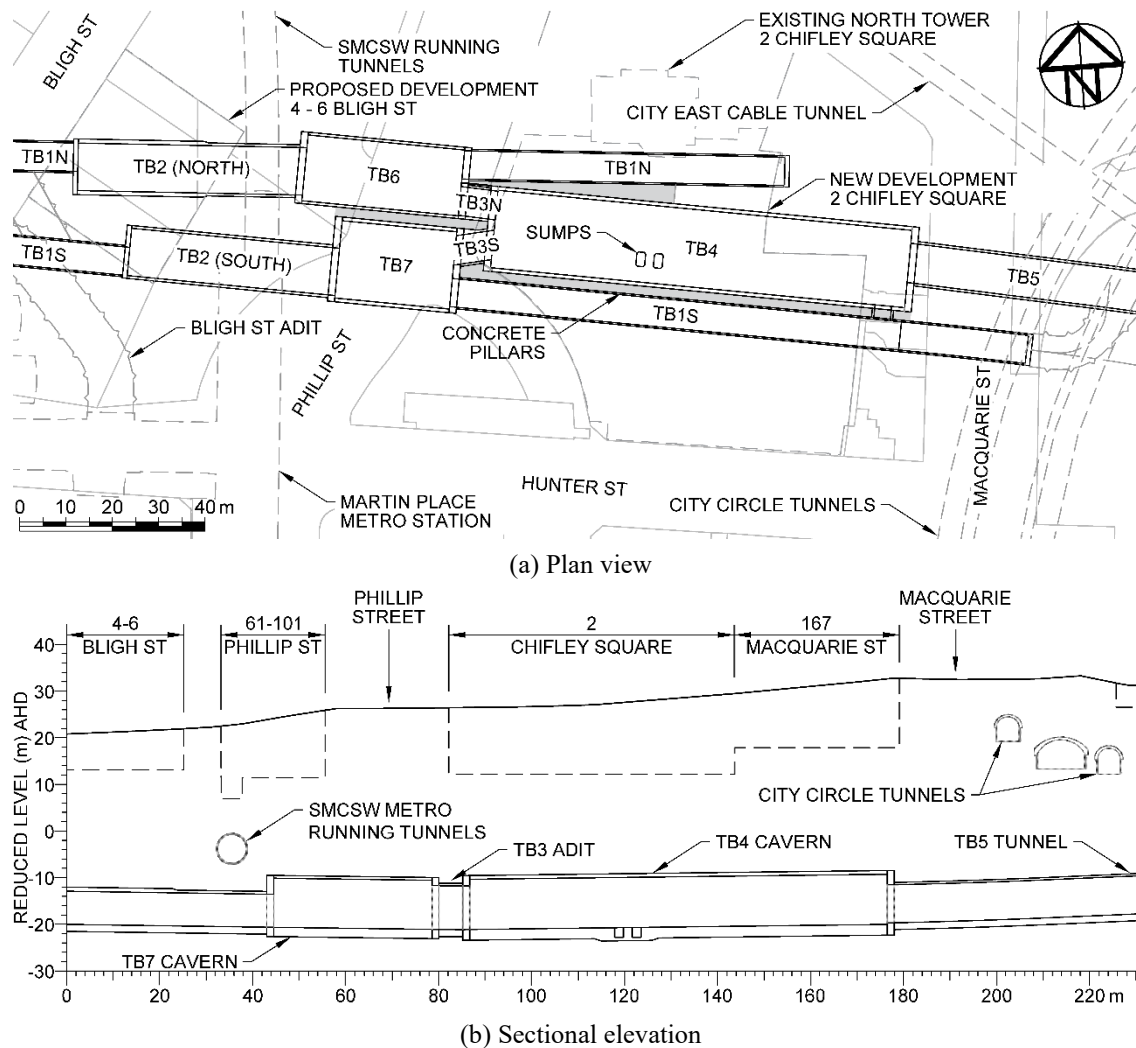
Plan and sectional elevation of the western portion of the turnback tunnels.
